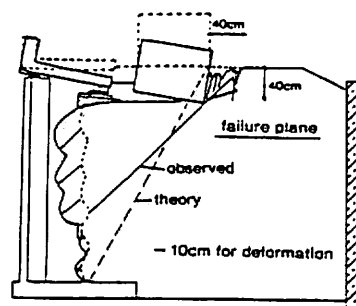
Wrapped-around wall face (Type B1) after loading from the crest of the test wall (Thamm et al., 1990, see Fig. 2.6 for the wall dimensions before loading).
